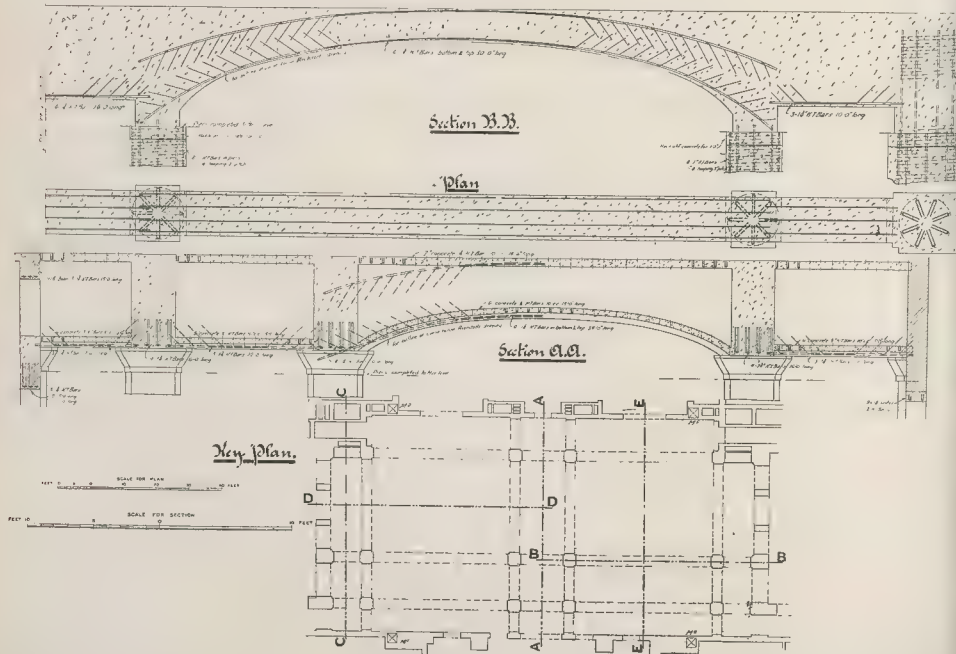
Details of Ceiling and Floor over Tea-Room.
